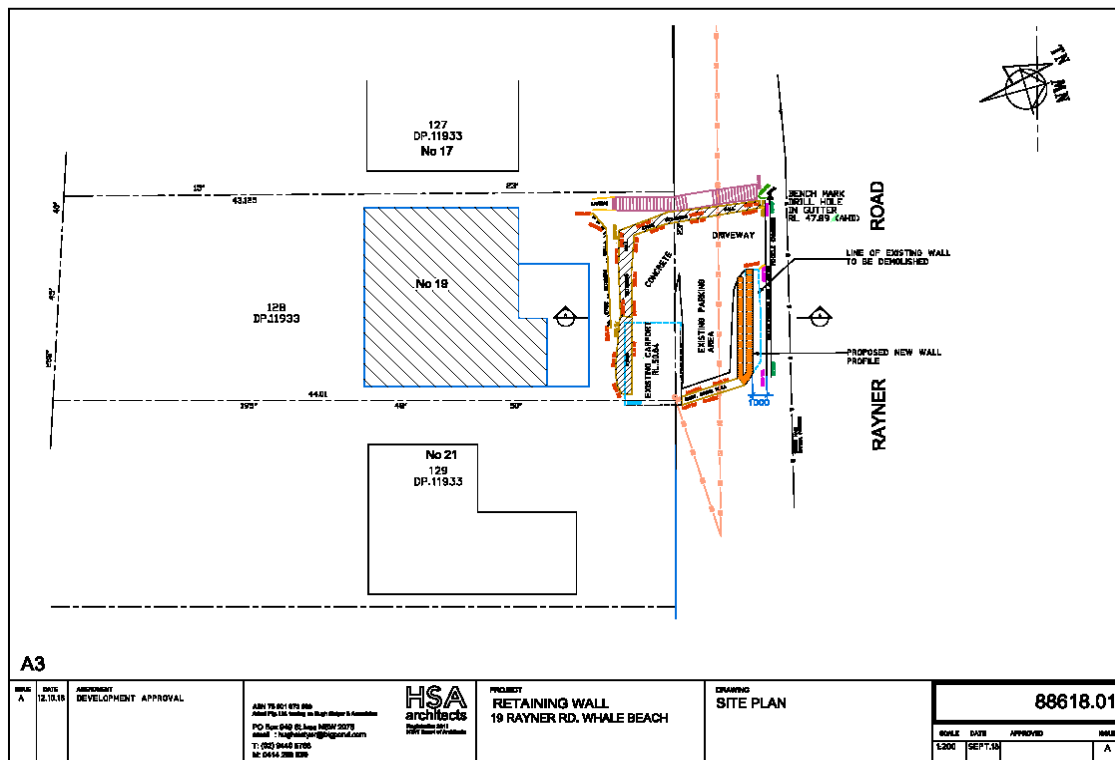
Plan view - Proposed driveway & sandstone retaining walls
